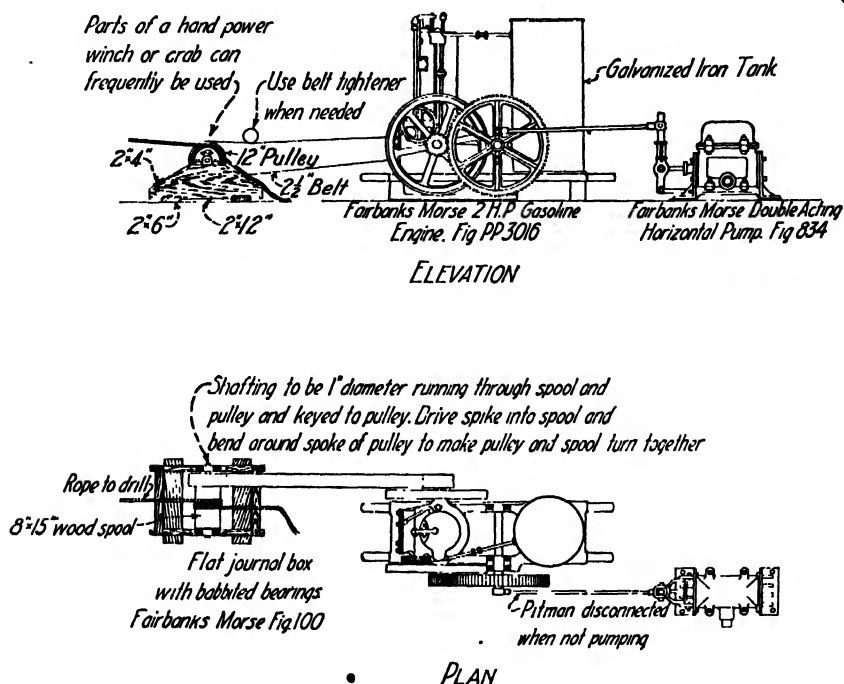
Arrangement of Gasoline Engine for Making Borings.
